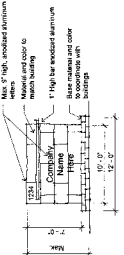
SIGNAGE - should be coordinated with building and form.
